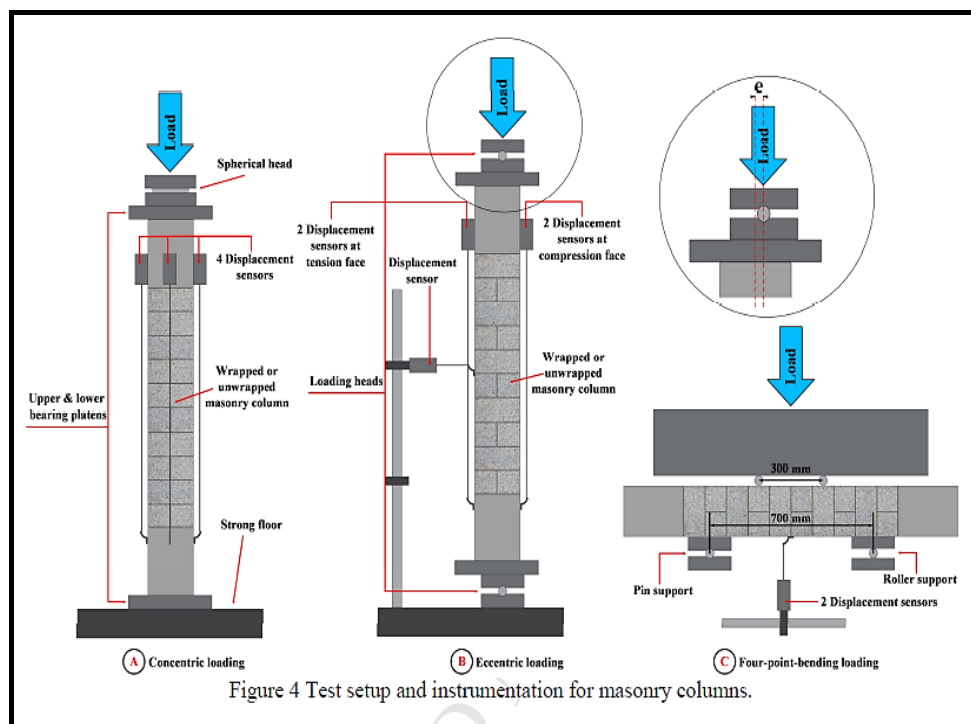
Specimens testing and instrumentation (Alotaibi and Galal (2018))
